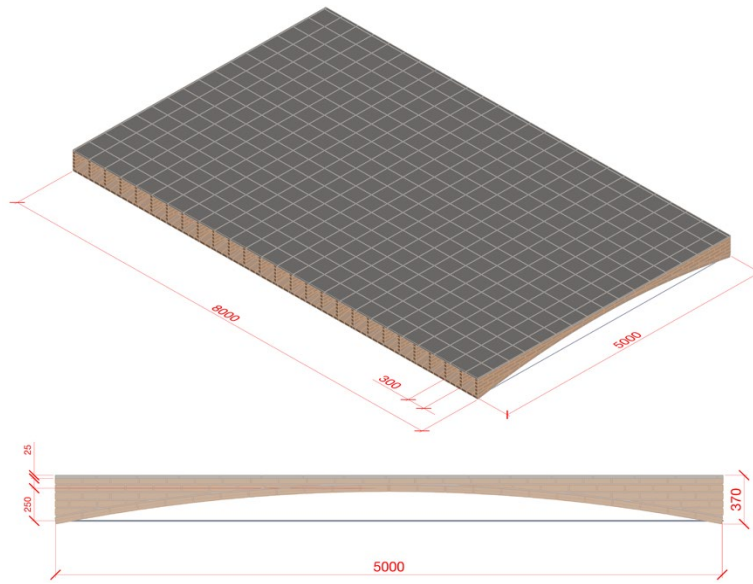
Earthen Vaulted Floor Design 1 (mm)
